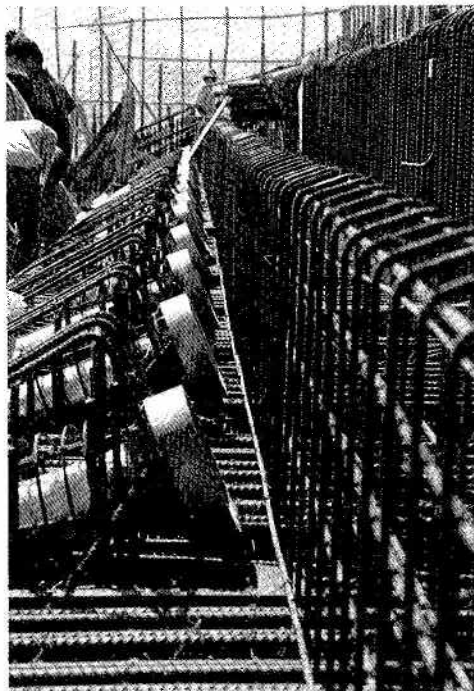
(b) Anchor pocket formed where cable net and ring beam have low angle of incidence
